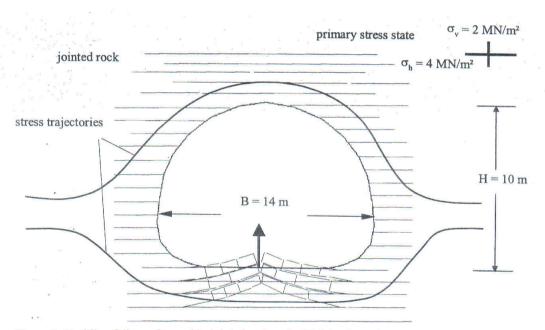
Buckling failure of tunnel in jointed rock under high horizontal stress.
